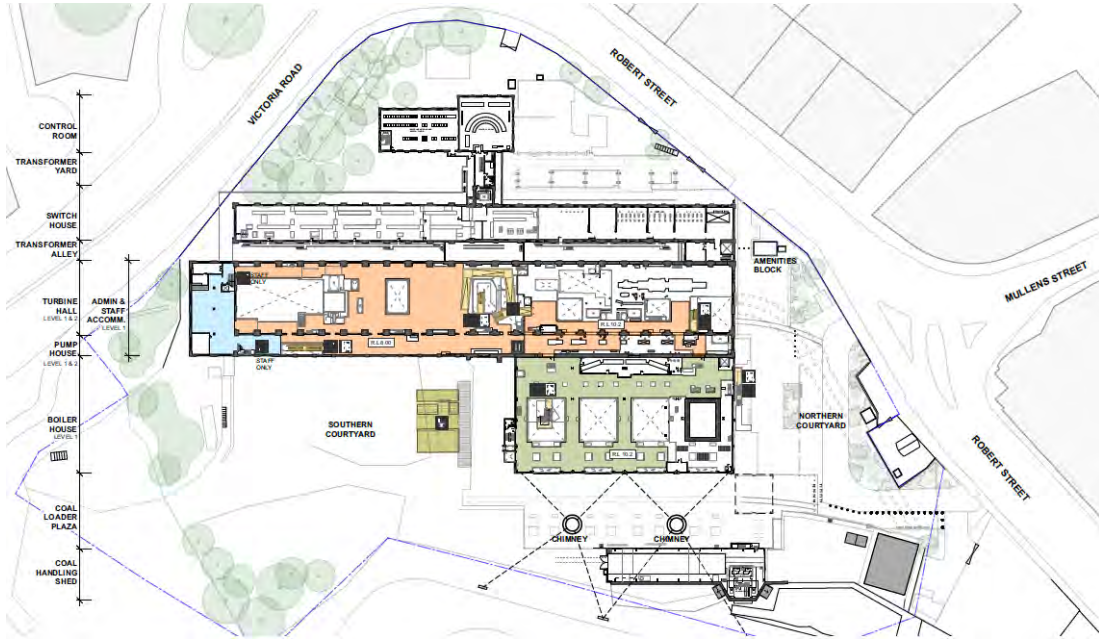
White Bay Power Station – Site Plan (Design 5 Architects)
